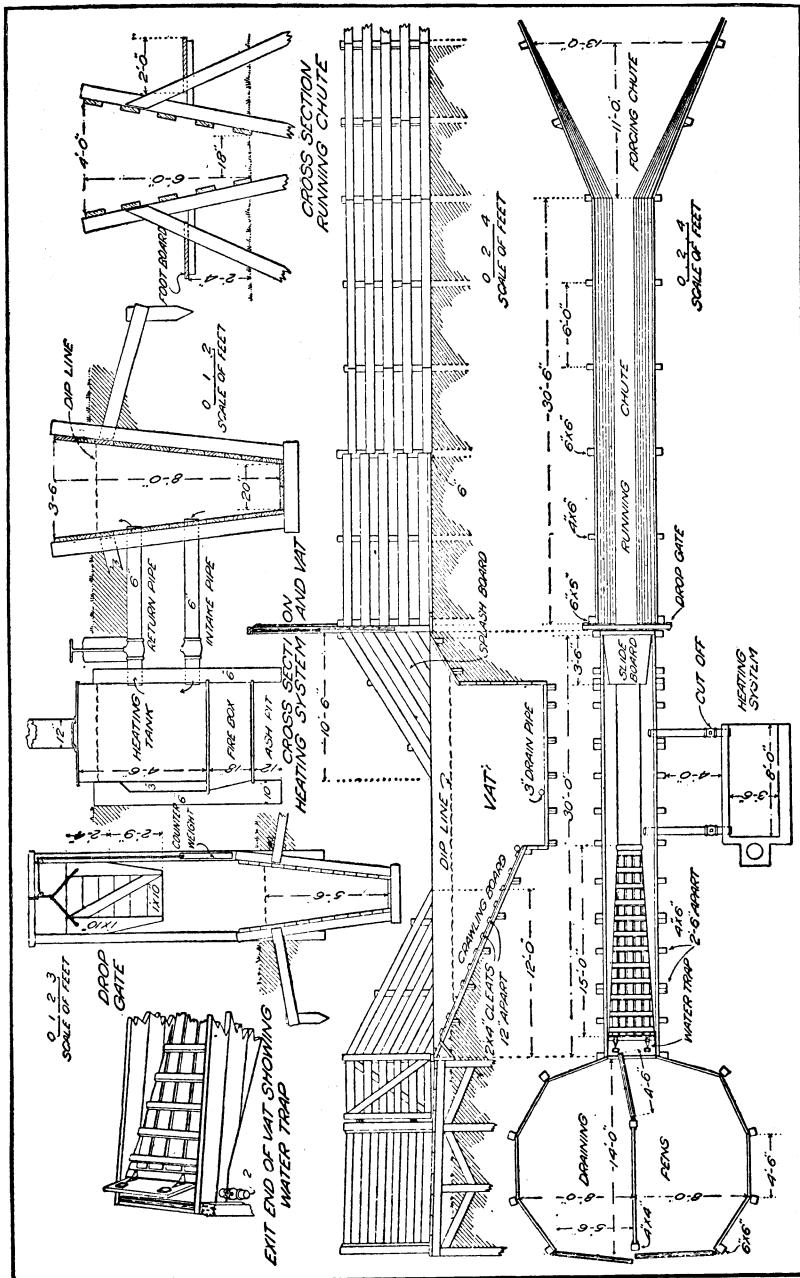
Plan of cattle-dipping plant with wooden vat.
